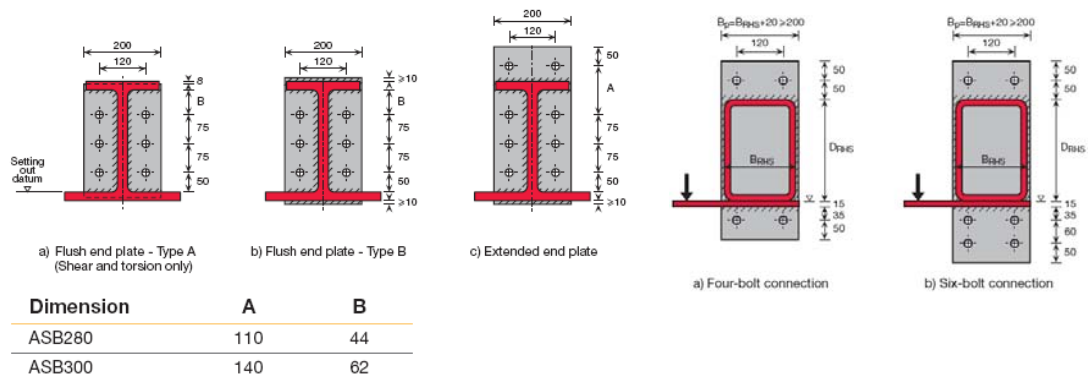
Detailing rules for end plate connections to ASBs and RHSFs [8]
